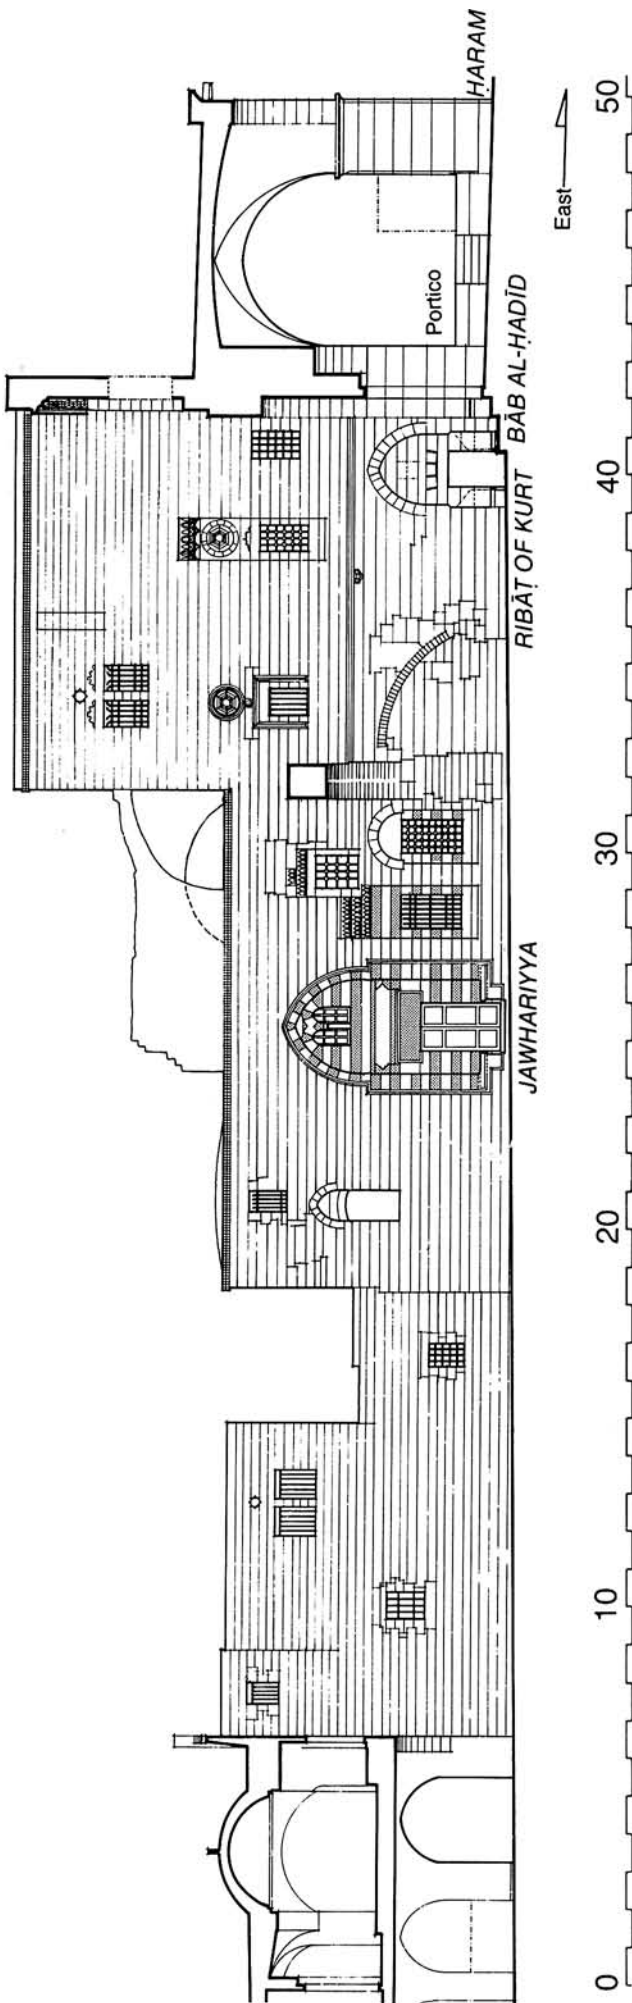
Tariq Bāb al-Ḥadīd: Elevation of north side of street
